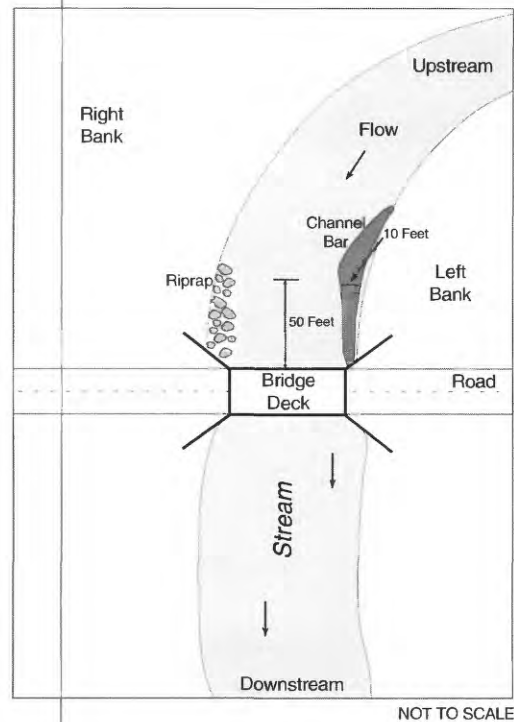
Plan view showing the location of a channel bar near a bridge. (Distance to mid-bar = 50 feet upstream, width at mid-bar = 10 feet)
